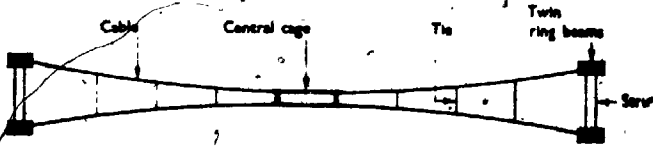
Cross-section of Concave Type Lens-shaped Roof
